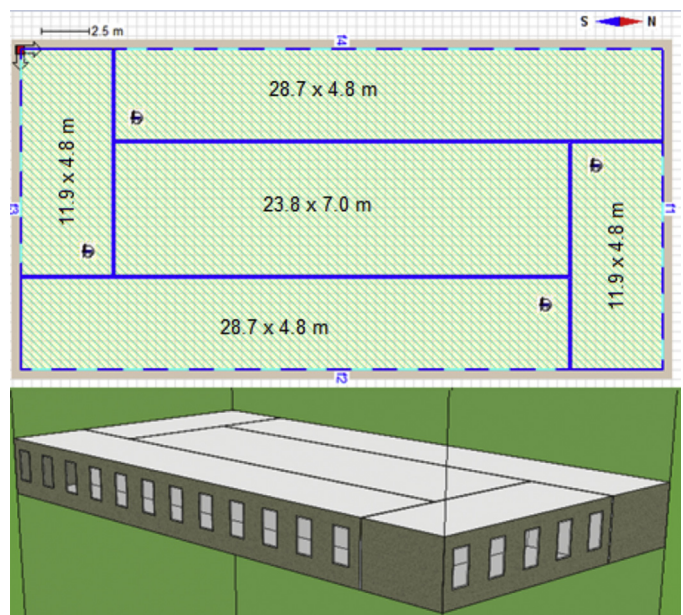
The generic model of single floor of an office building constructed with 2.4 m room module—plan and 3D view. The locations of workplaces used for control of lighting are marked in the plan.
